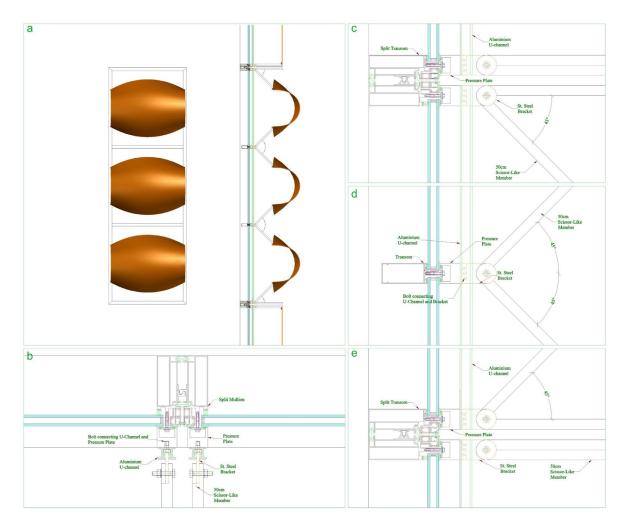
Façade unit design concept: a) Unit elevation (left) and vertical section (right); b) Horizontal section showing the joint and connection between adjacent units; c)-e) Vertical section of adjacent units.
